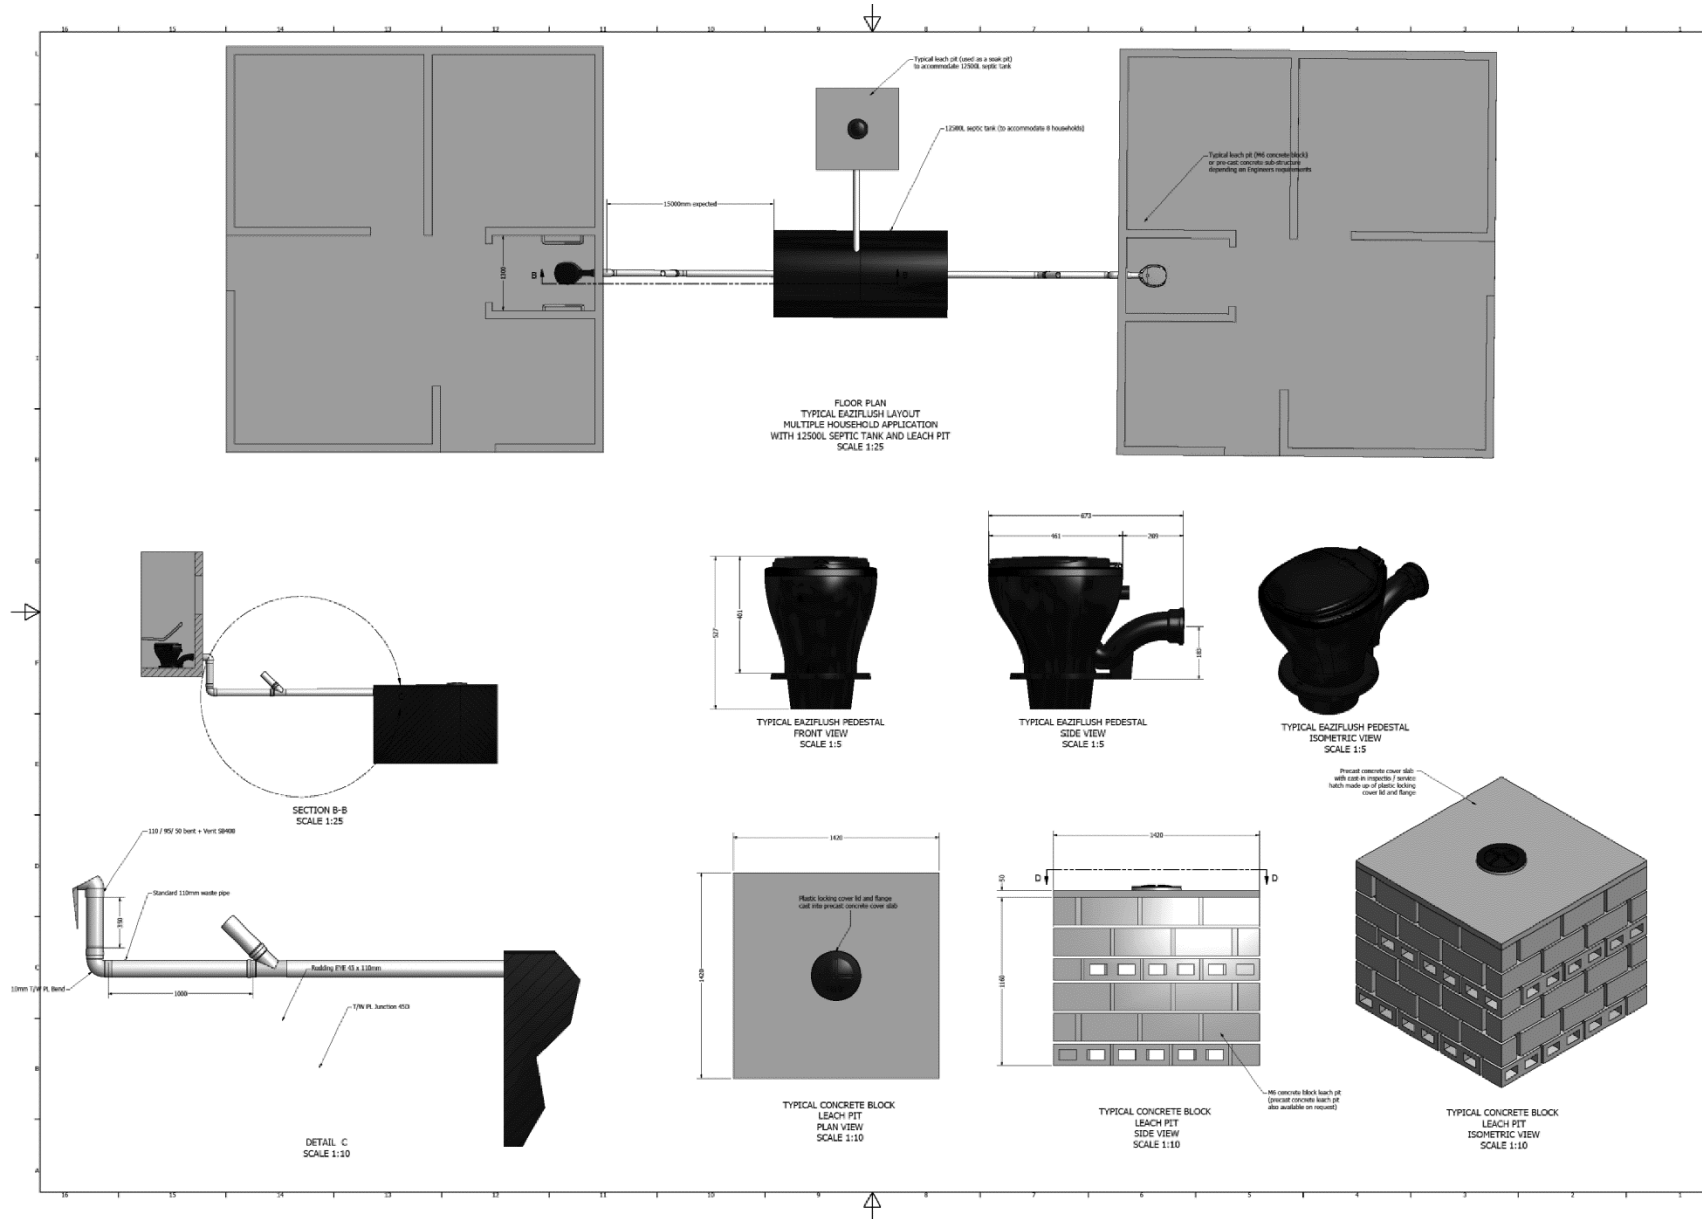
Proposed sanitation design for institutional buildings (leach pit with septic tank) (Makhetha 2016)
